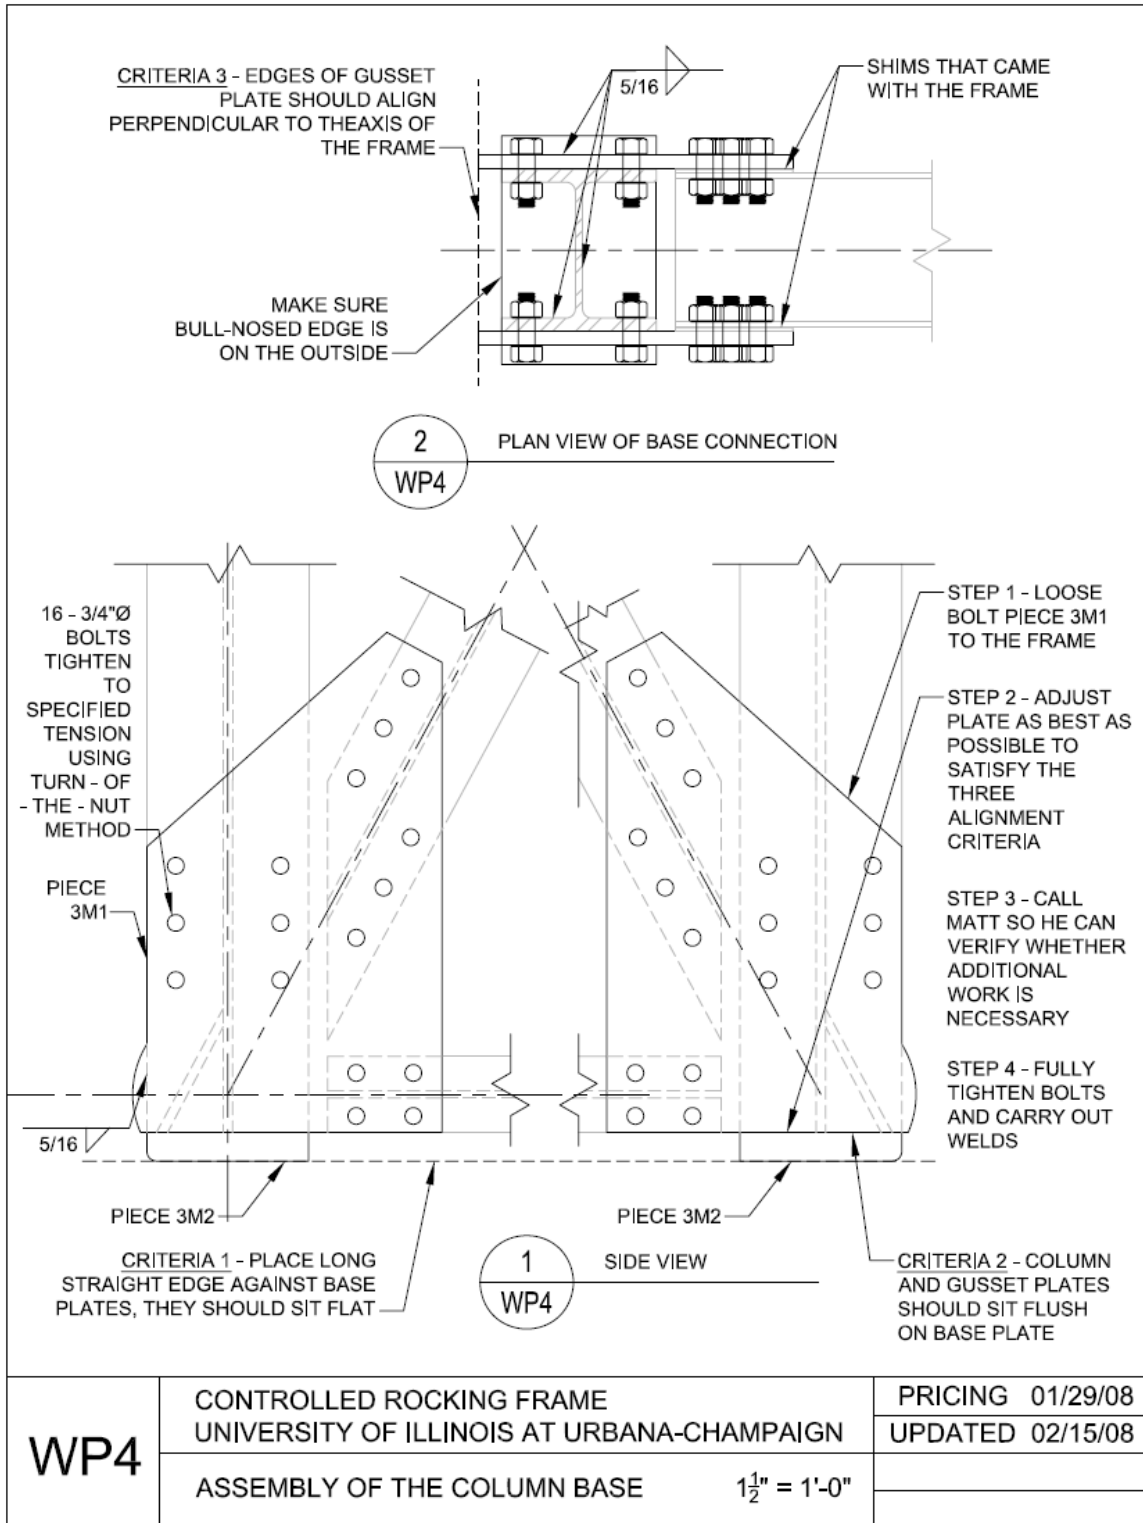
Work Plan Drawing – Assembly of the Column Base
